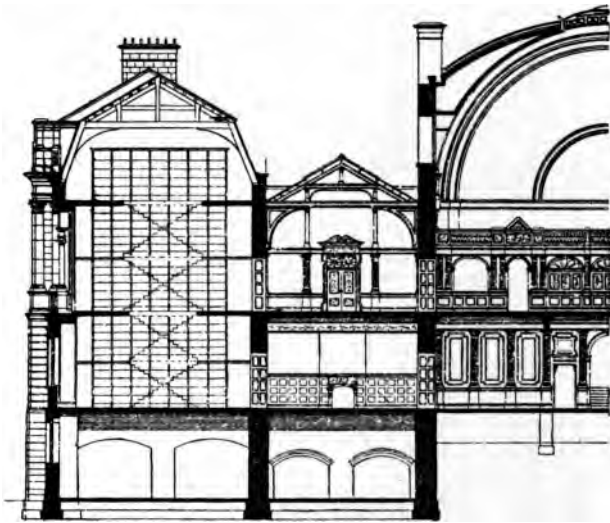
National Library of Ireland—section through the building, showing the arrangement of the book-stack.
